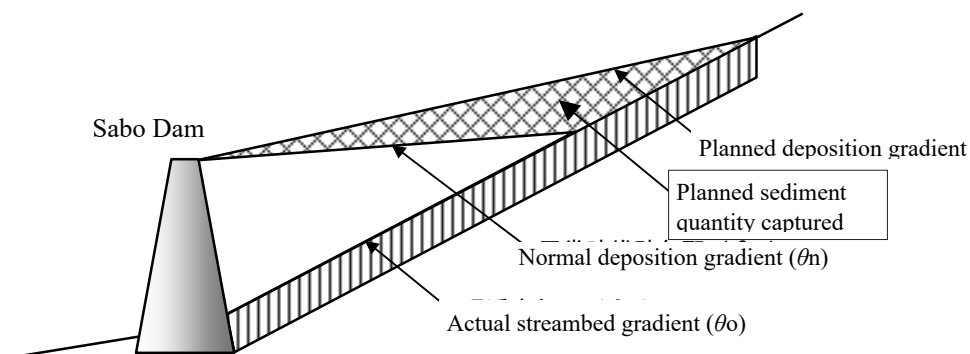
Conceptual Illustration of Non-permeable Sabo Dam
